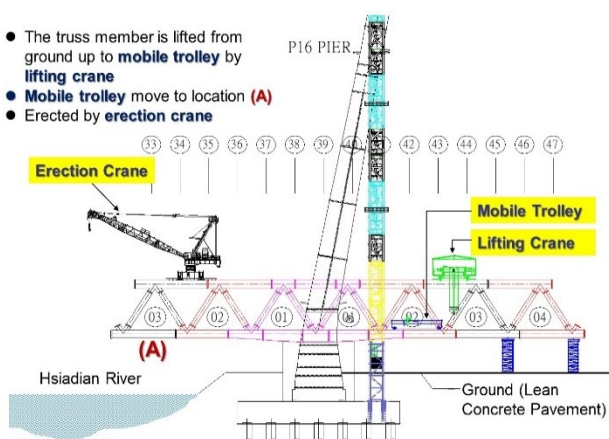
The design drawing of the erection system for truss frame (ESTF).
